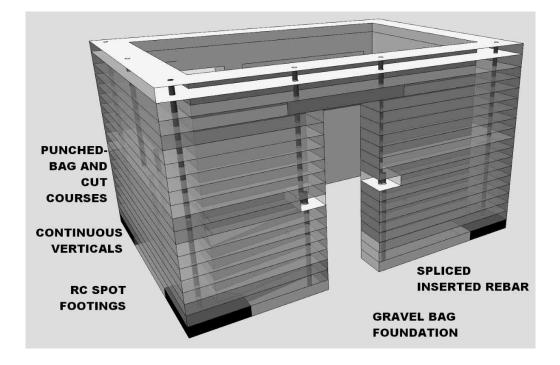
Corners strengthened by embedded continuous rebar base-anchored in spot reinforced concrete footings connected to gravel bag foundation.
